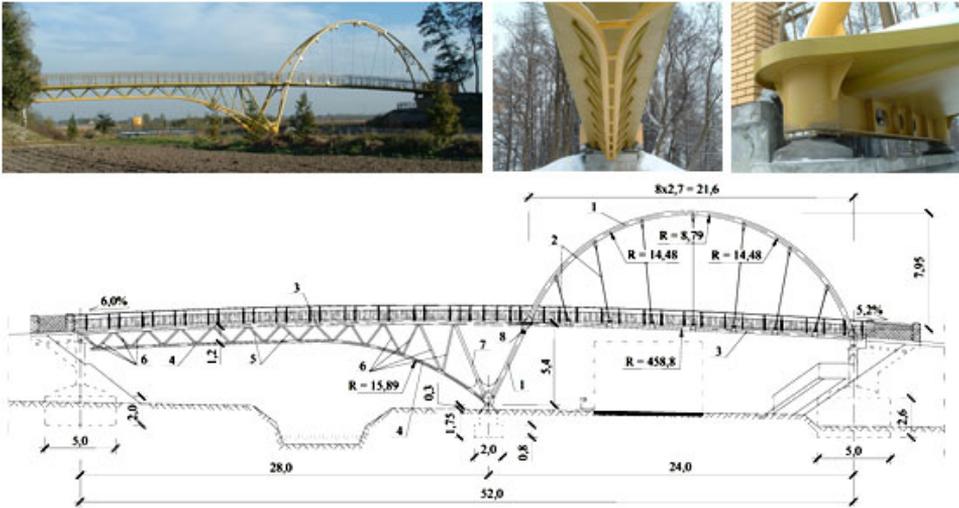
Arch footbridge in Bieruń Stary, Poland (Engineering Studio Project s.c.): 1 – steel tube $\varnothing 244.5/8$ mm; 2 – steel bar $\varnothing 30$ mm; 3 – steel box-girder filled with concrete (steel plate 6 mm thick); 4 – steel tube $\varnothing 193.7/14.2$ mm; 5 – steel tube $\varnothing 101.6/7.1$ mm; 6 – steel tube $\varnothing 108.0/8.0$ mm; 7 – steel tube $\varnothing 168.3/12.5$ mm; 8 – hinged connection constructed using elastomeric bearing placed in steel tubes.
